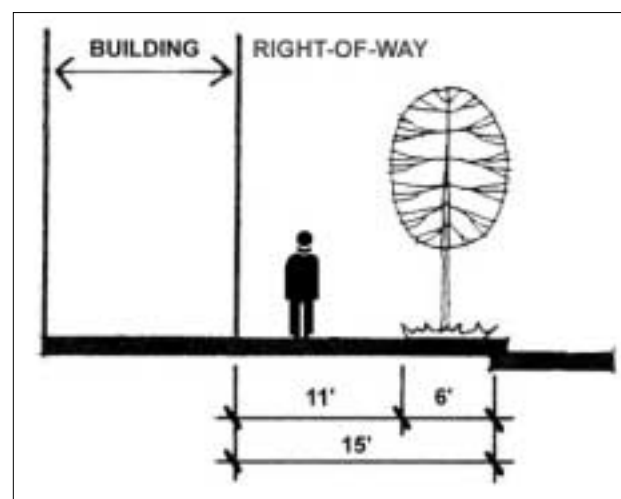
TOD and CAC setbacks and building placement will create an attractive area for pedestrians.
